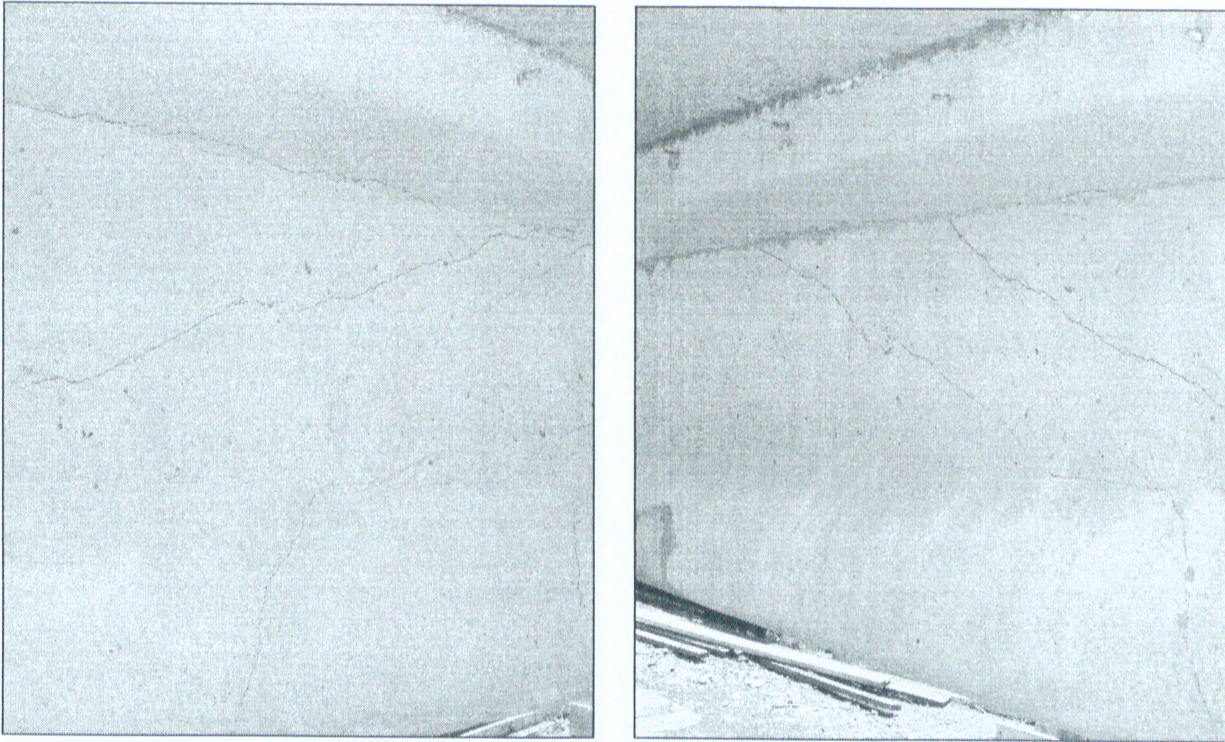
View of two girder sections after sandblasting procedures (north face)
